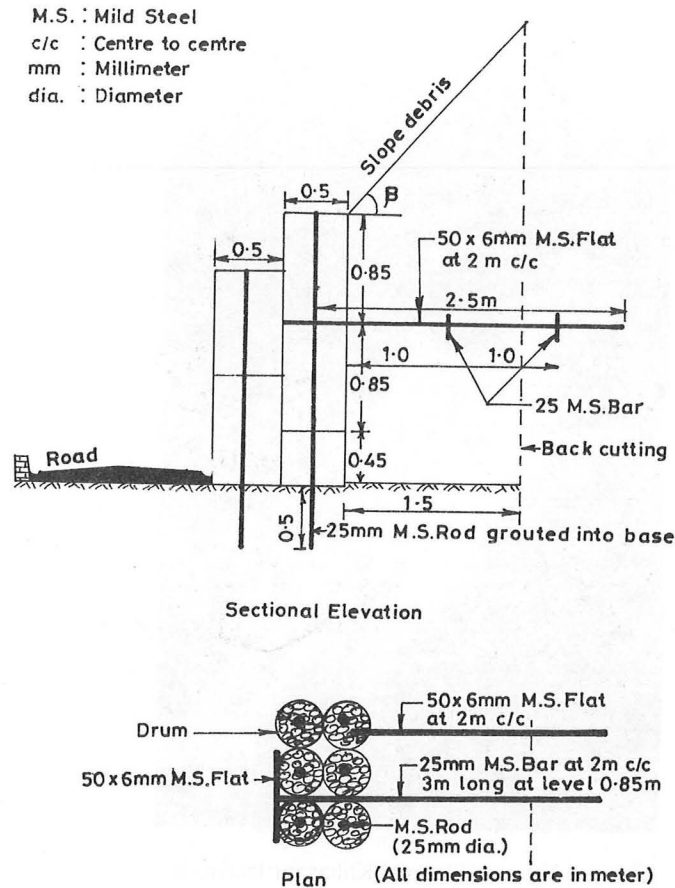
Anchored drum diaphragm wall - its plan and sectional elevation
